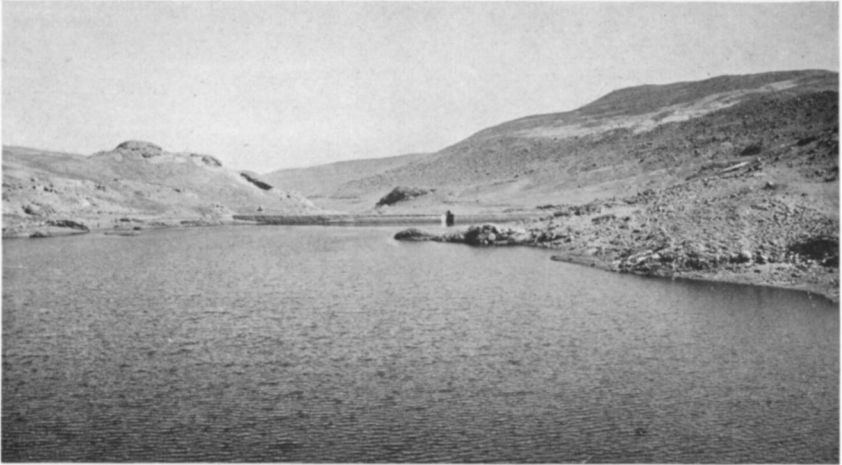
Looking downstream toward old Chalviri dam, lake being half full. The canal is tunneled through the dark hill in rear of dam.
